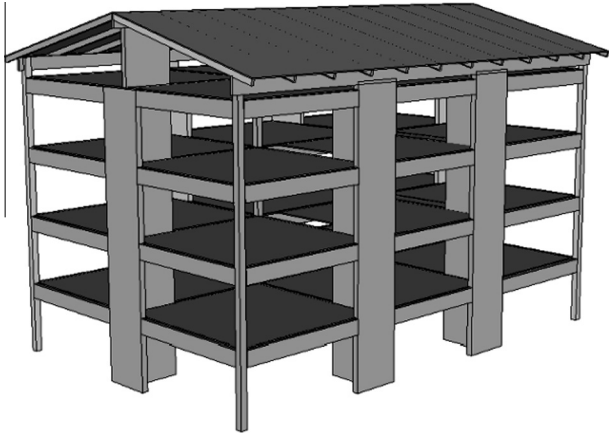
Illustration of a multi-storey timber building with Trä8 post and beam structural system, including the stabilising wall elements.
